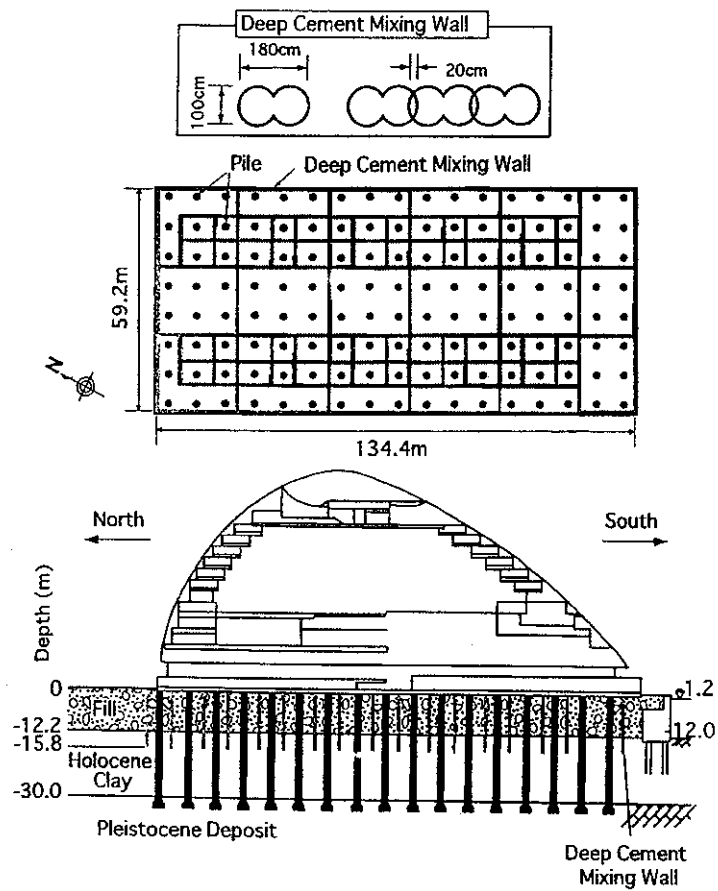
Cross-Section and Plan of Oriental Hotel (Hamada and Wakamatsu 1996)
